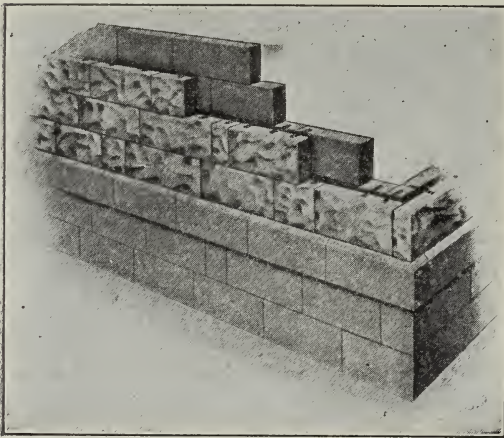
Hollow Wall of Solid Concrete Blocks.
